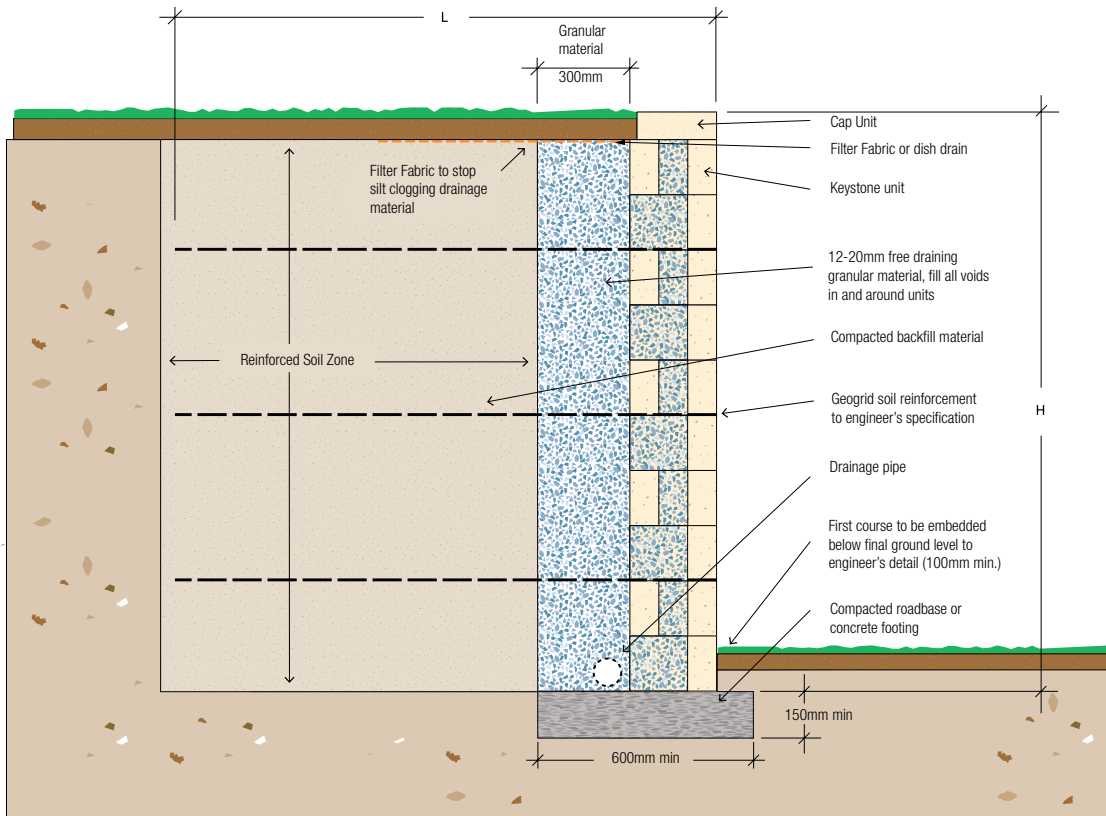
Typical Construction Detail - Keystone® Geogrid Reinforced-Soil Wall
